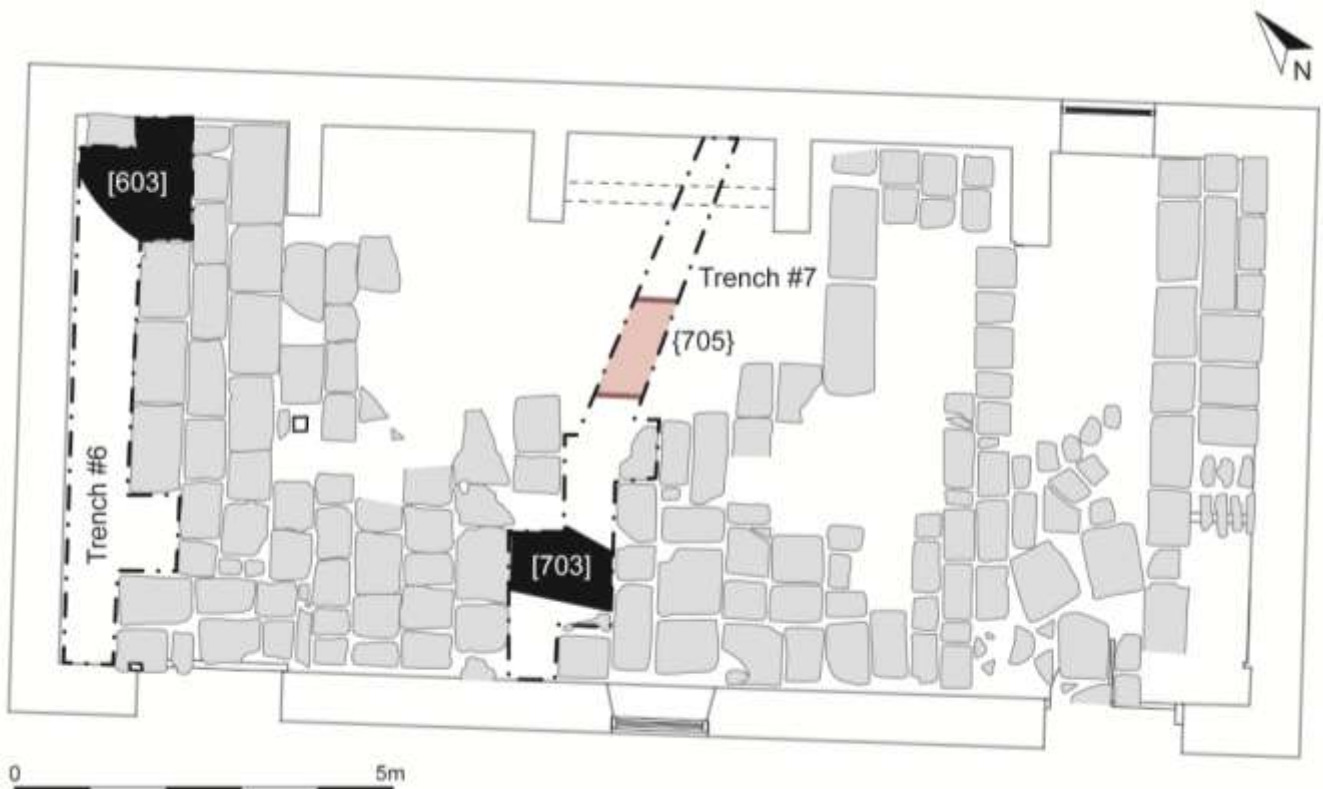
Plan of the ground floor of B1, showing the location of the trenches and the surviving granite paving.
